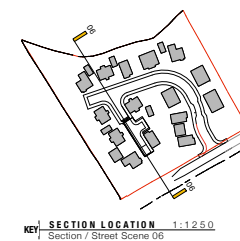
PL_005 Proposed Sections / Street Scenes: Sheet 2 (not to scale)
